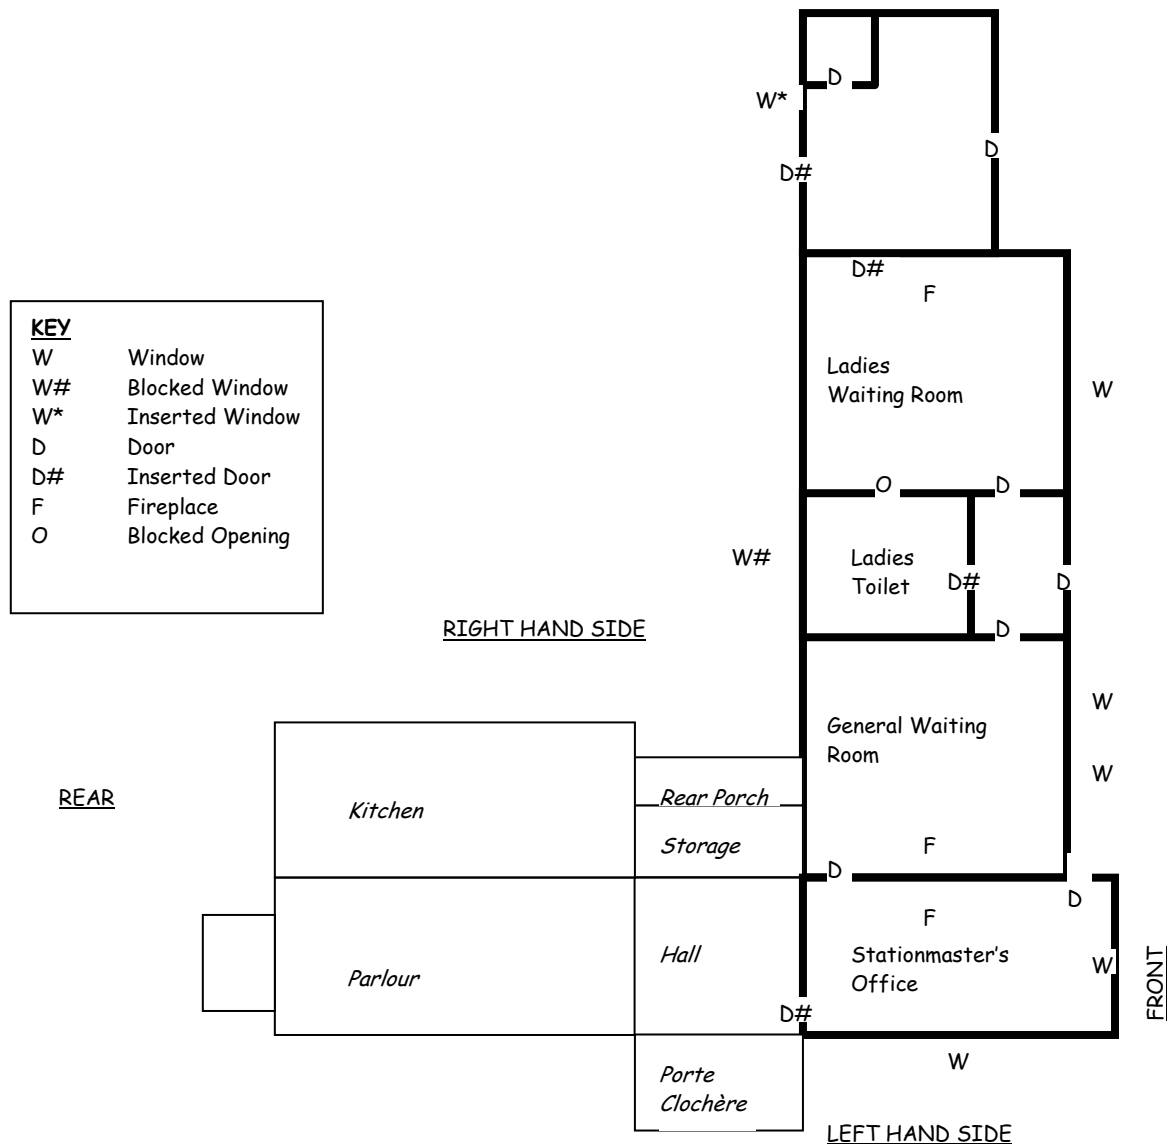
RAILWAY BUSINESS - GROUND FLOOR
